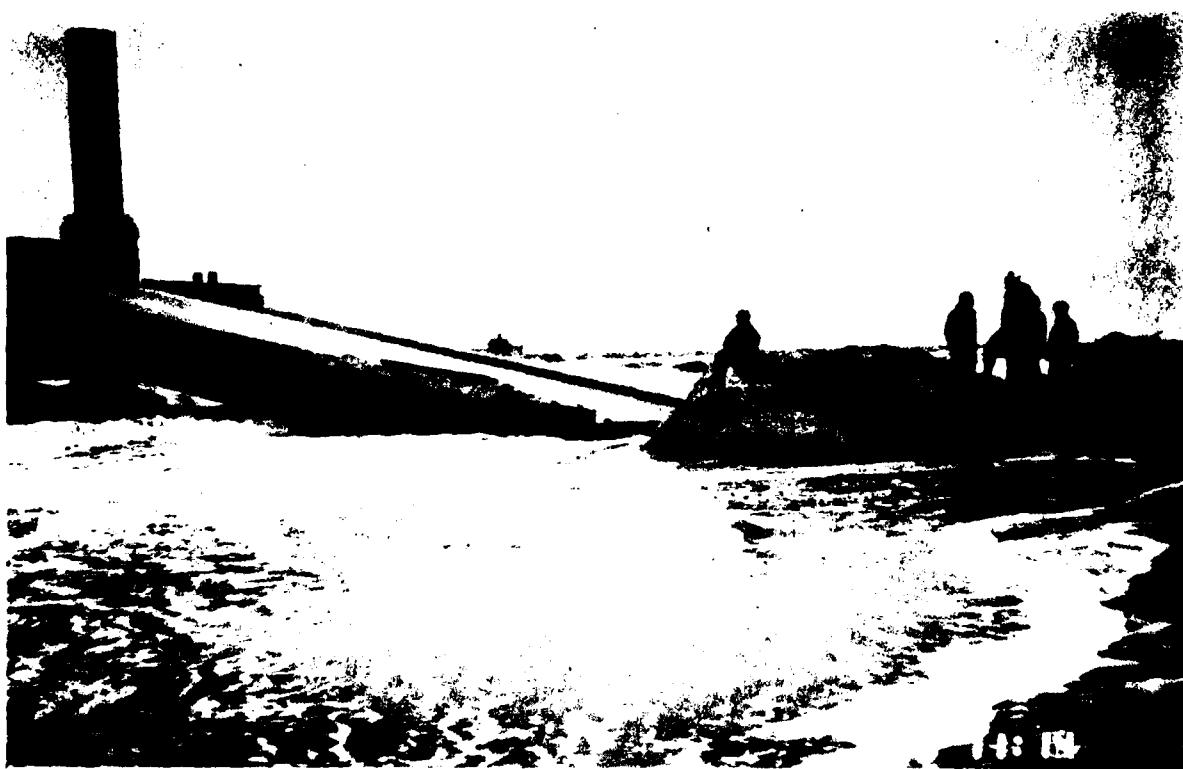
Storm Damage to DeLong Ramp Abutment
